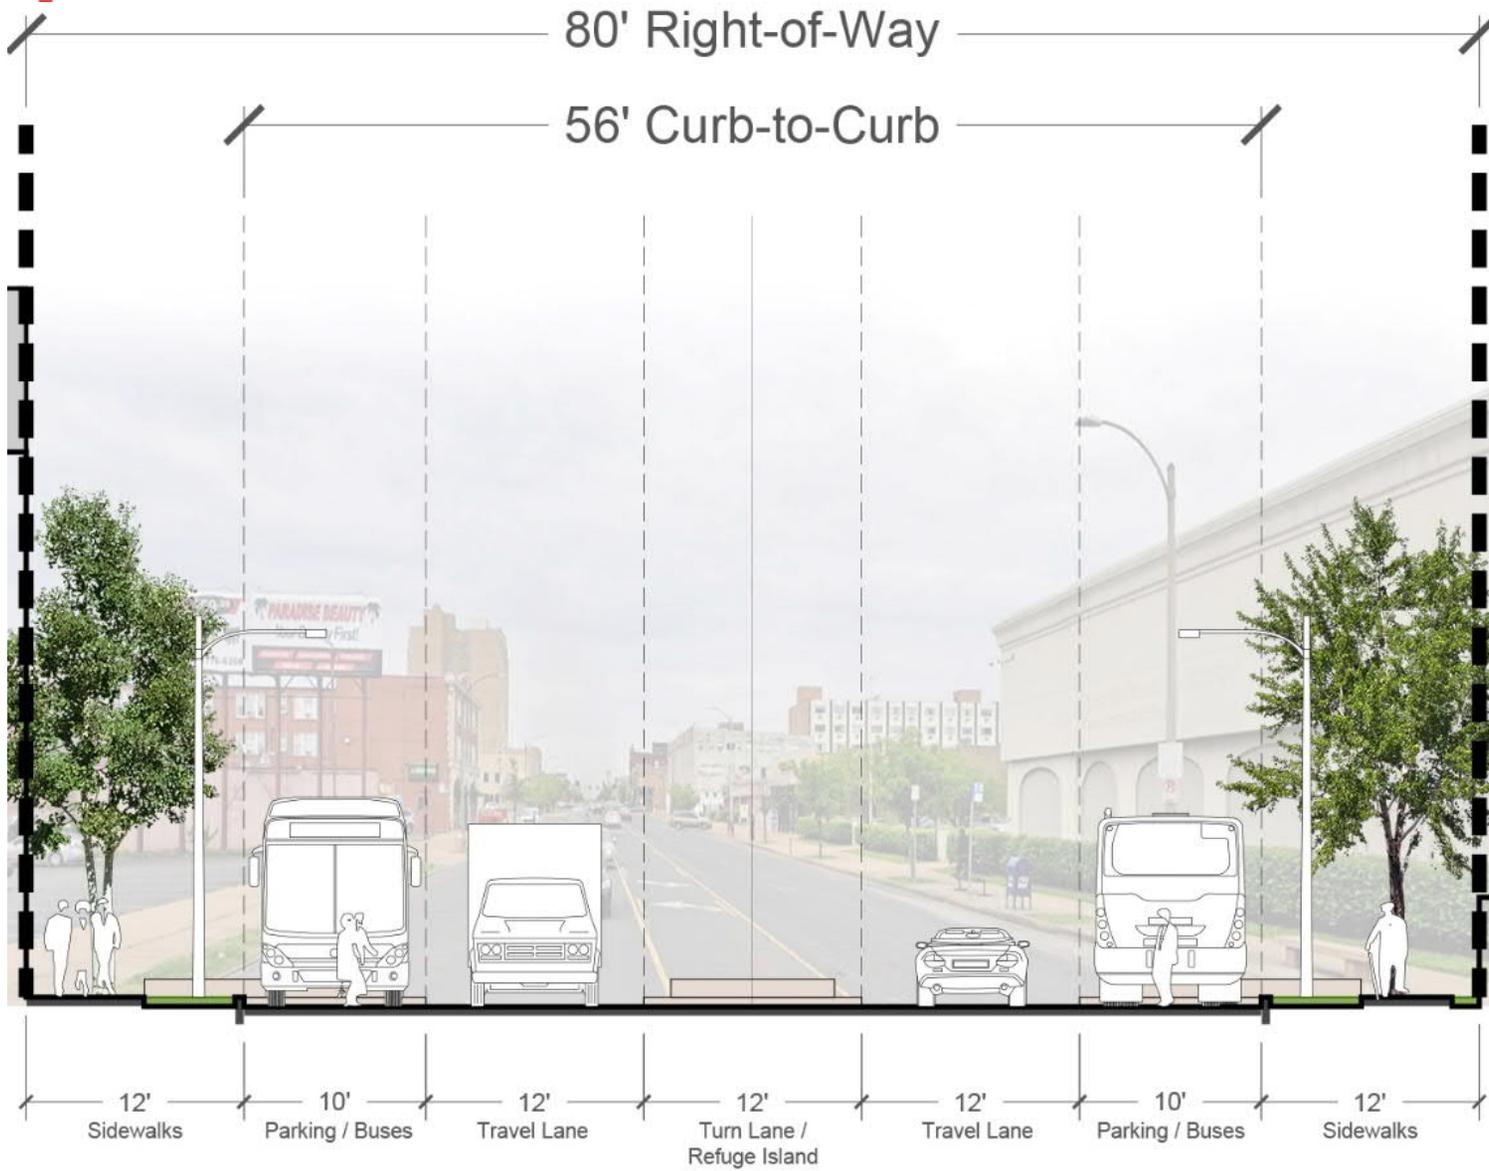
Option A Typical Cross-Section (Gravois Avenue to Chippewa Street)
